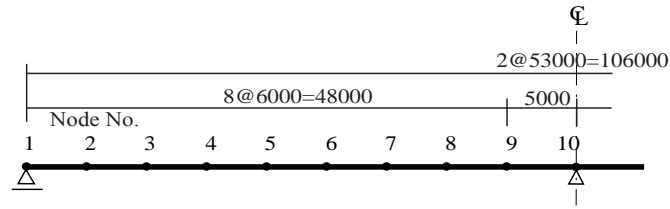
Two-span continuous composite girder model (53+53 m) and dimensions of the steel girder (unit: mm).
